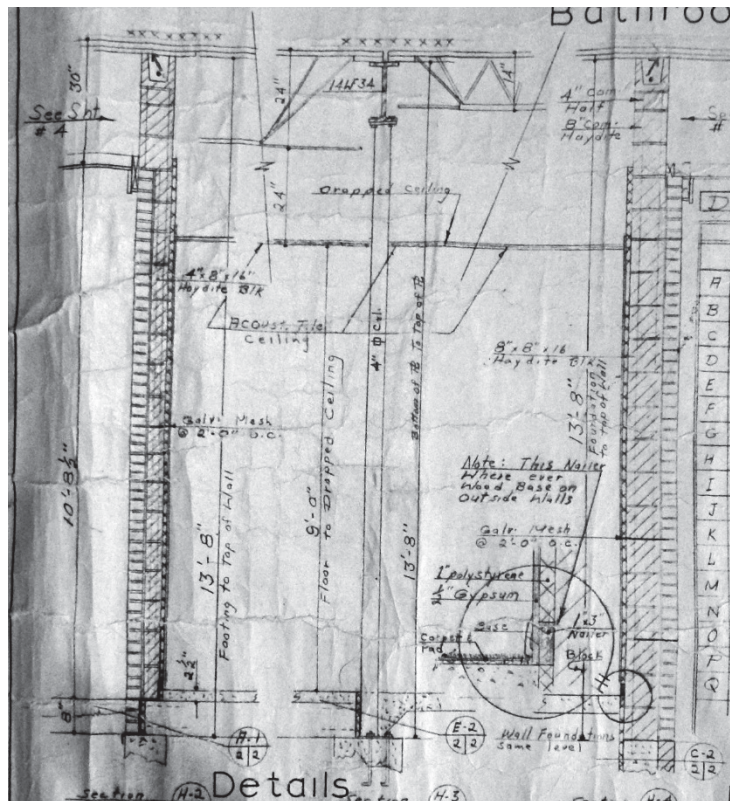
Wall profiles, 1966 plan showing footings (Building plans)
